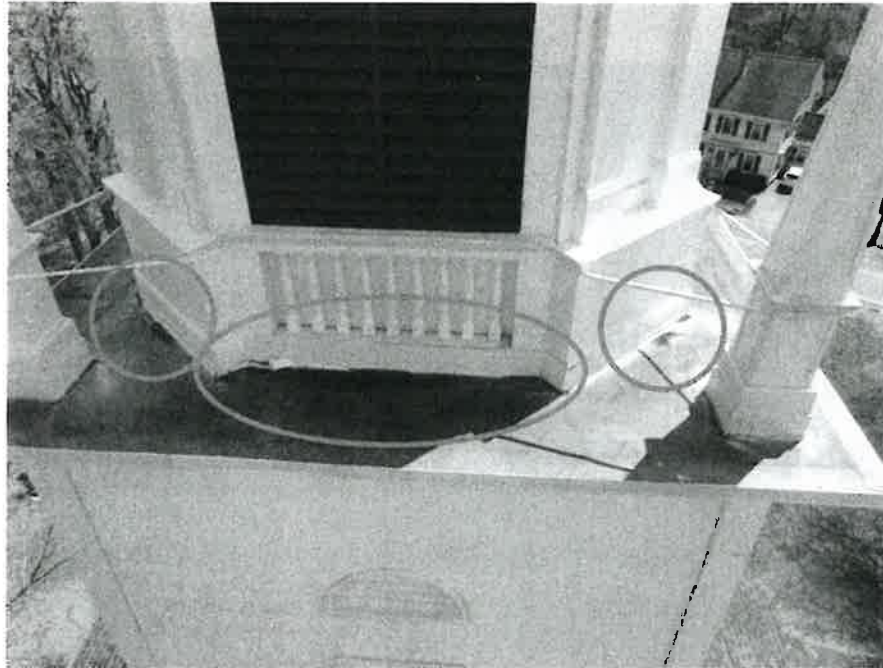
Standing water and detached sealant/flashing at the north face belfry level
